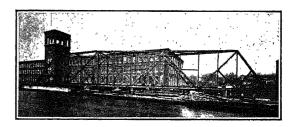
Completed Arc Welded Through Truss Type Bridge
